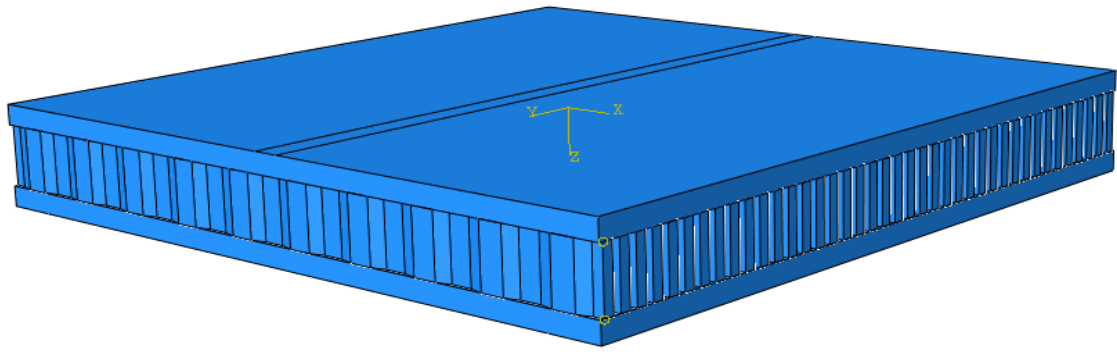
Assembled Model of Honeycomb Sandwich Slab Panel
